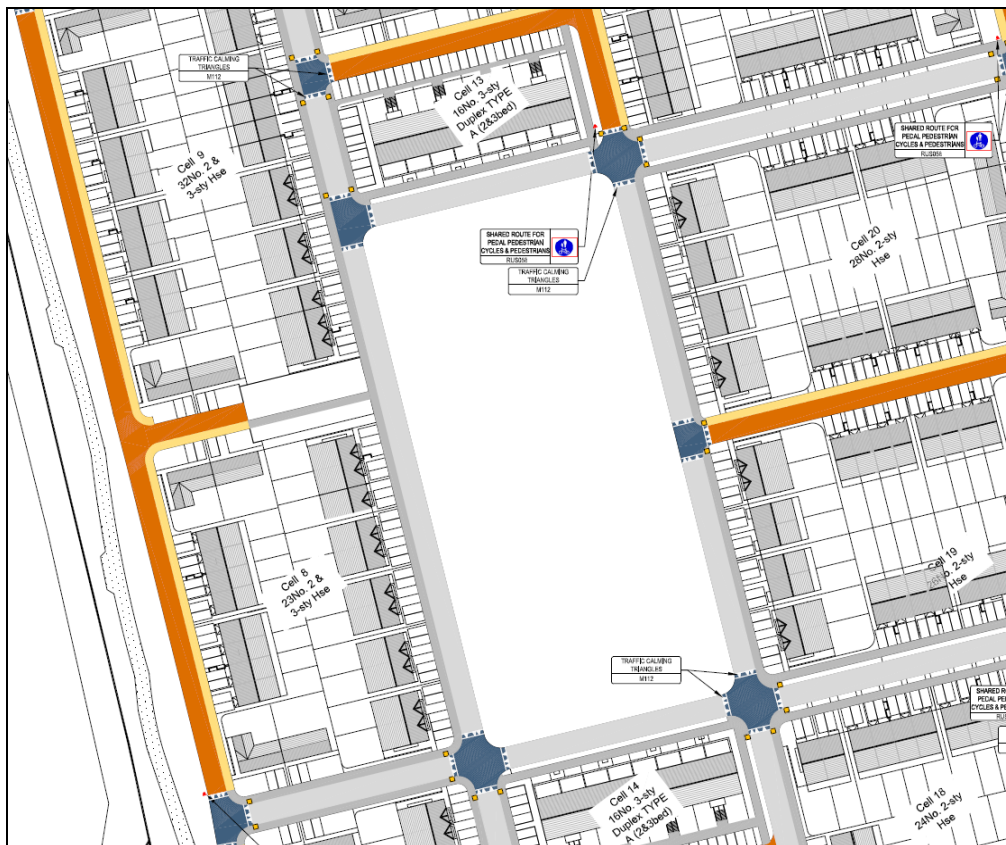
Proposed Open Space Area and Adjoining Road Network (Source: JOR Drawing Road Signage & Markings Layout Plan Sheet 1 of 3, ref. 032, rev. 3)
